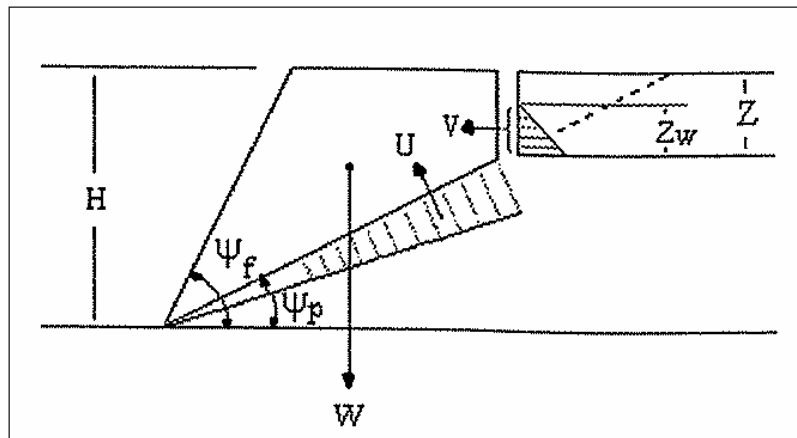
Forces acting on a block on a failure plane of a slope with a tension crack in its upper surface (Hoek and Bray, 1981)
